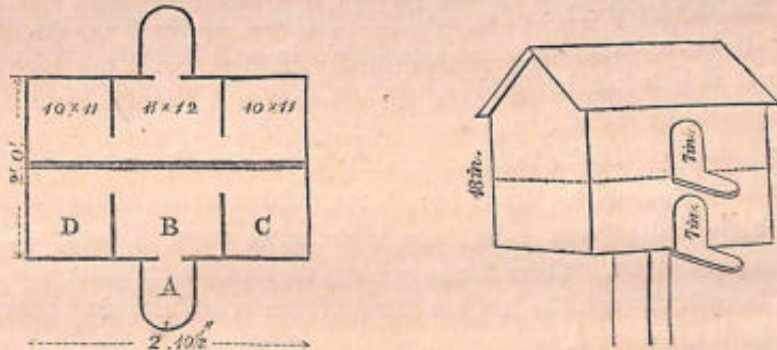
FIG. VI.—PLAN AND ELEVATION OF A TWO-STORIED POLE PIGEON-HOUSE.
